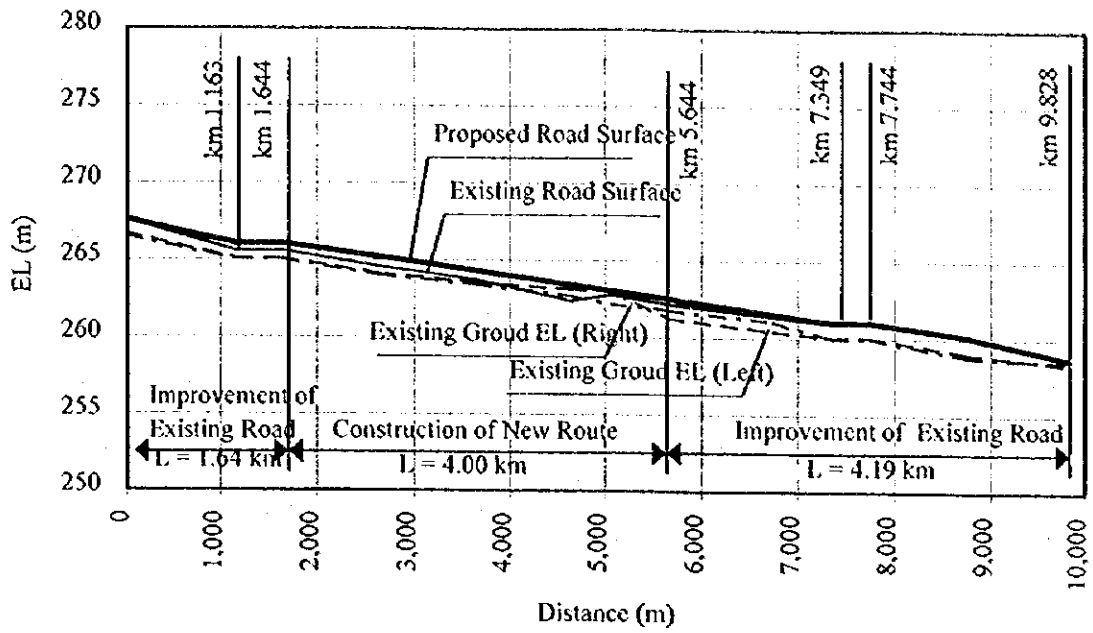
LONGITUDINAL PROFILE OF ROAD-CUM-EMBANKMENT
